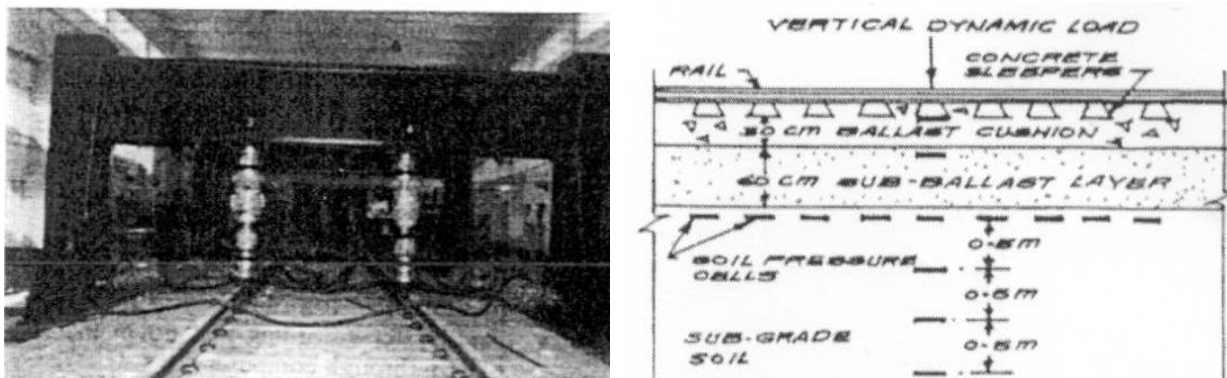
Picture of the full scale test section apparatus and typical cross section of the testing area
